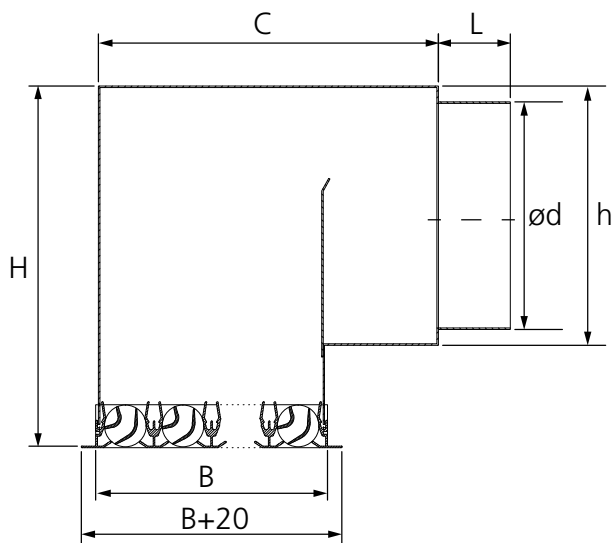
Dimensions, VZ-41 with plenum box, horizontal duct connection (mm). B+20 = Dimensions including support profiles.
